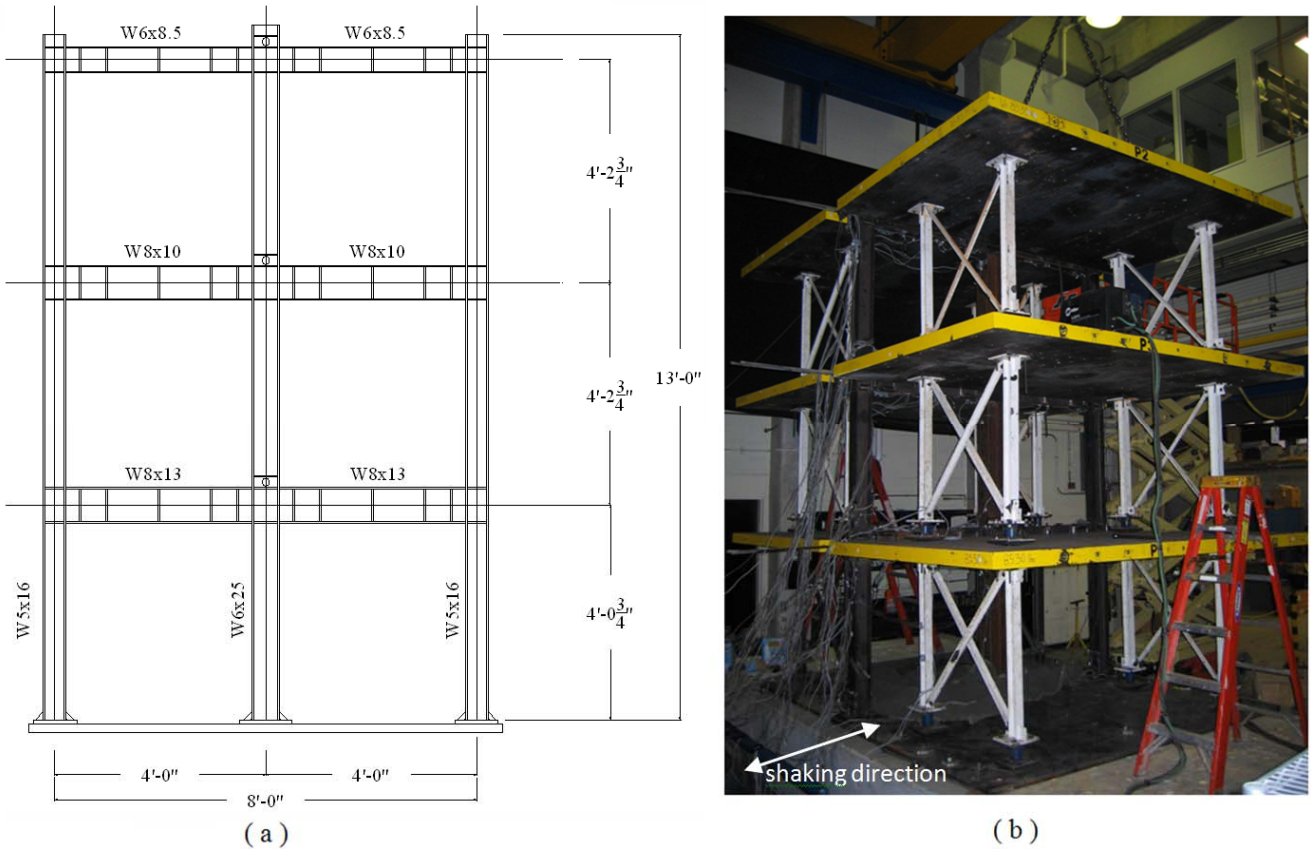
SMRF and SCPT frame model (a) elevation view (b) frame with FMS installed on the shake table
